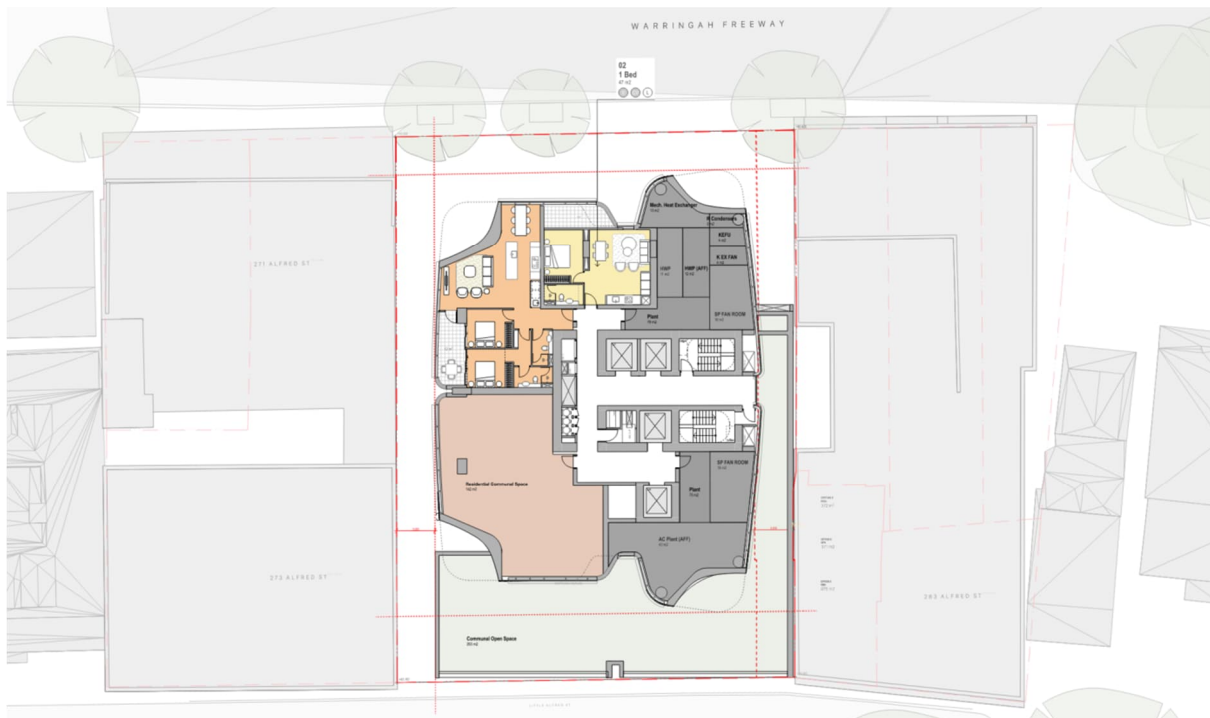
Level 11 – 16 Tower Lowrise Residential Plan
